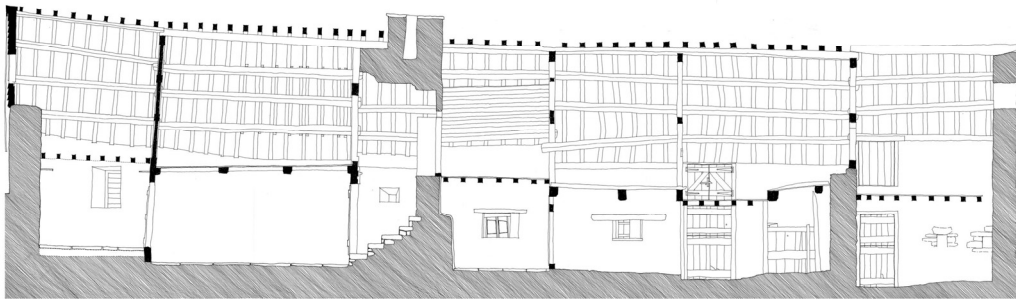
Construction section through Llannerch y cawr 1:200
